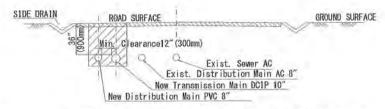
Typical Section of Additional Water Transmission Main-3 (PVA intersection – Minatobashi Bridge)
